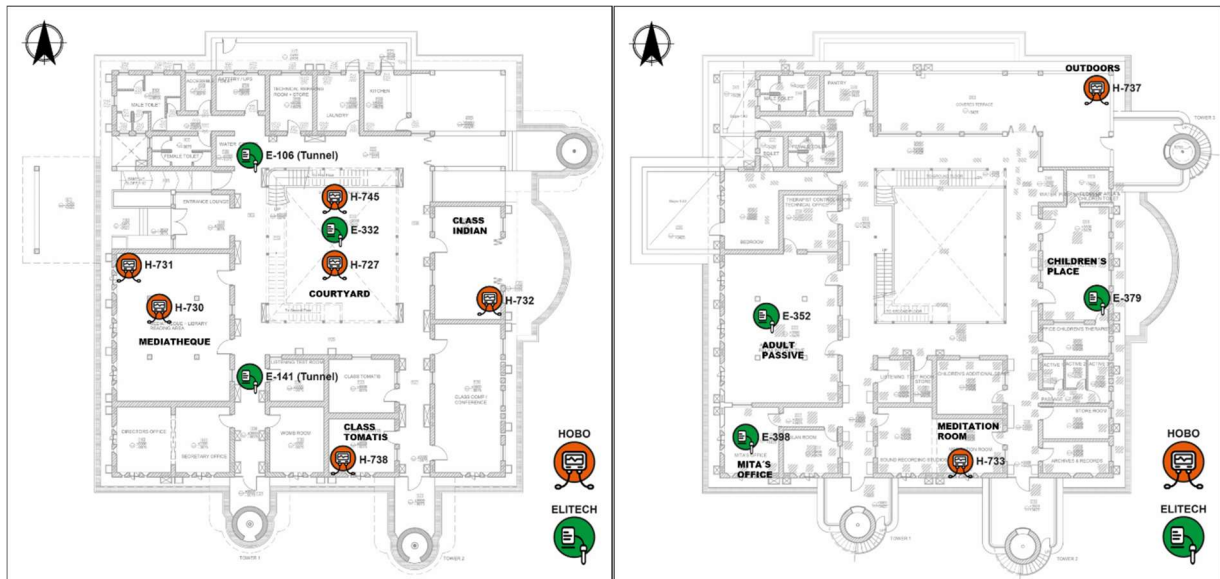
Layout showing equipment distribution within the building on Ground (left) and First floor
